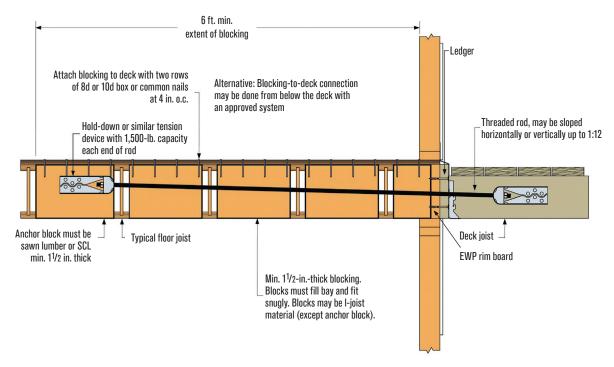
When a deck is attached to a house with an I-joist floor system where the joists are parallel to the rim joist, blocking and fasteners must be added as shown before installing the lateral load anchors. A similar detail is available from WIJMA for when the I-joists are oriented perpendicular to the rim joist.
